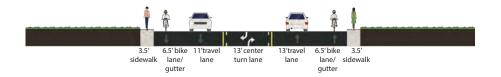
West Elizabeth Street Existing Cross Sections
